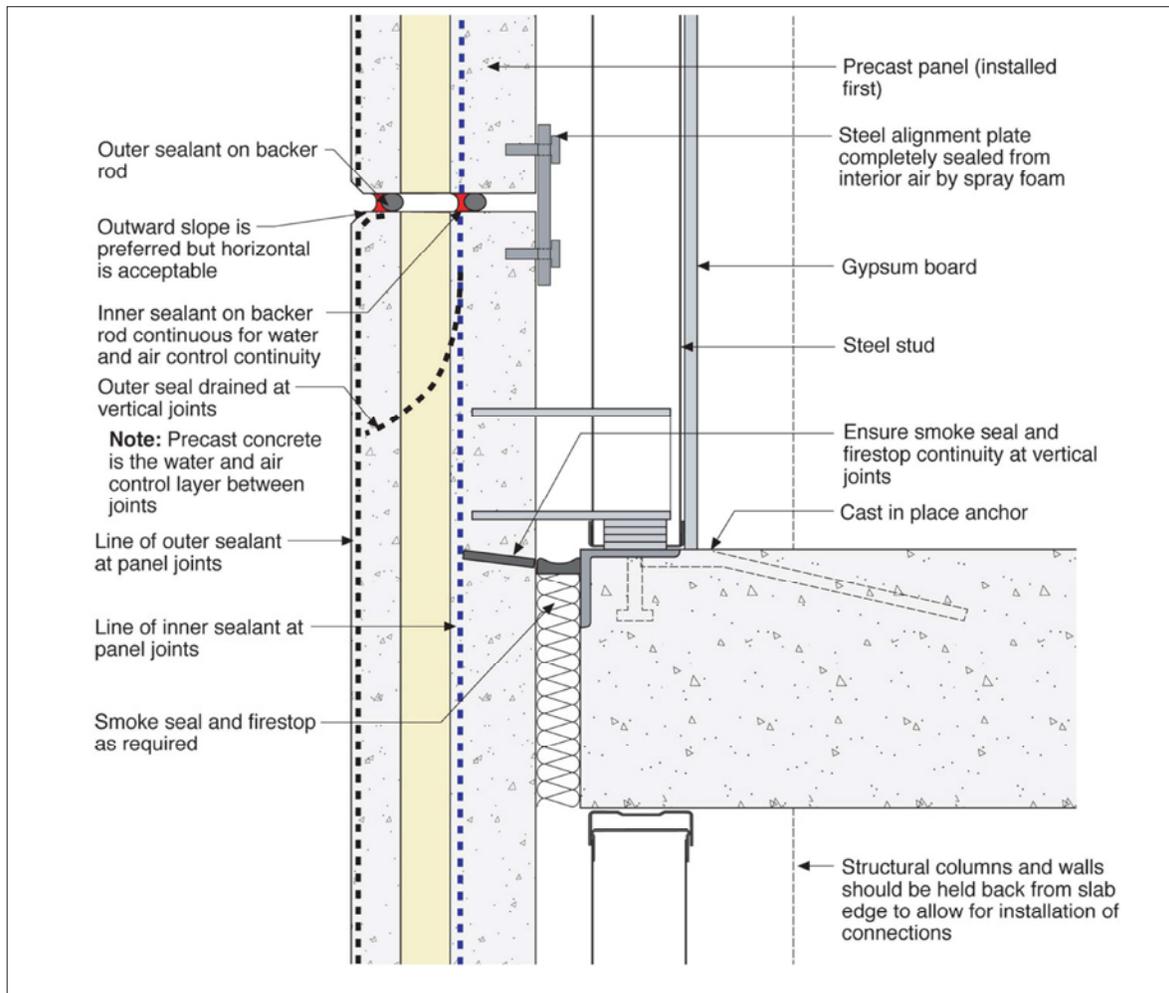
Sealant joint detailing for double wythe precast concrete insulated wall panel.
